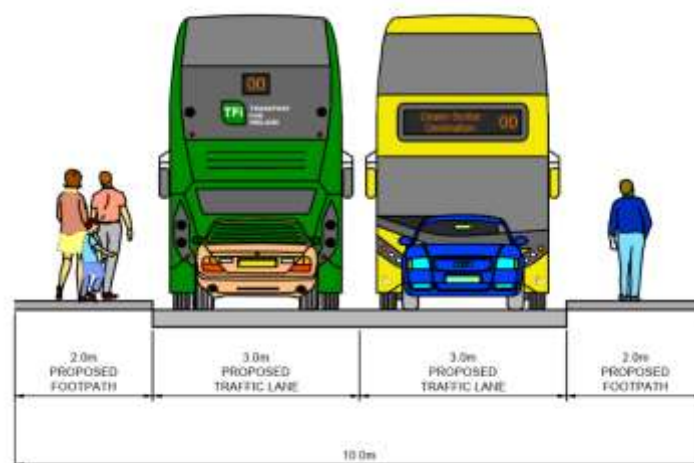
Typical Traffic Management Cross Section (B-B)
